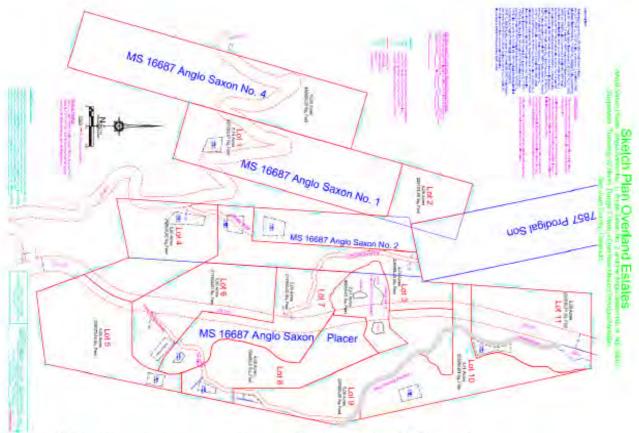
Site Schematic. Adapted from Southwest Land Surveying, LLC Sketch Plan.
